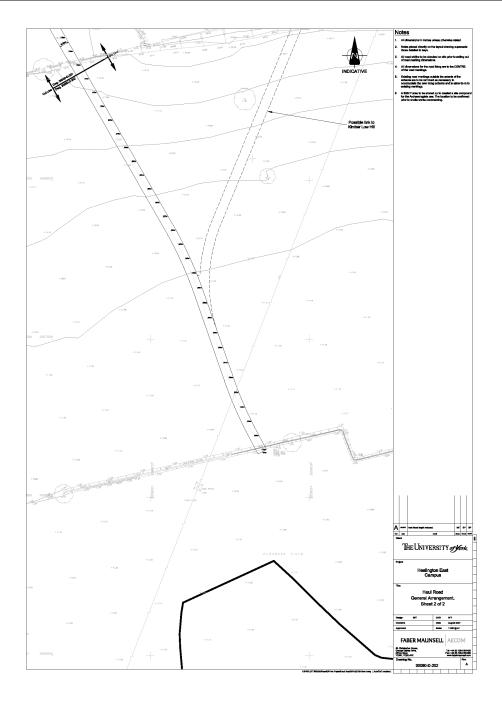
Location plan on the southern portion of the haul road (developer supplied plan, not to scale)
